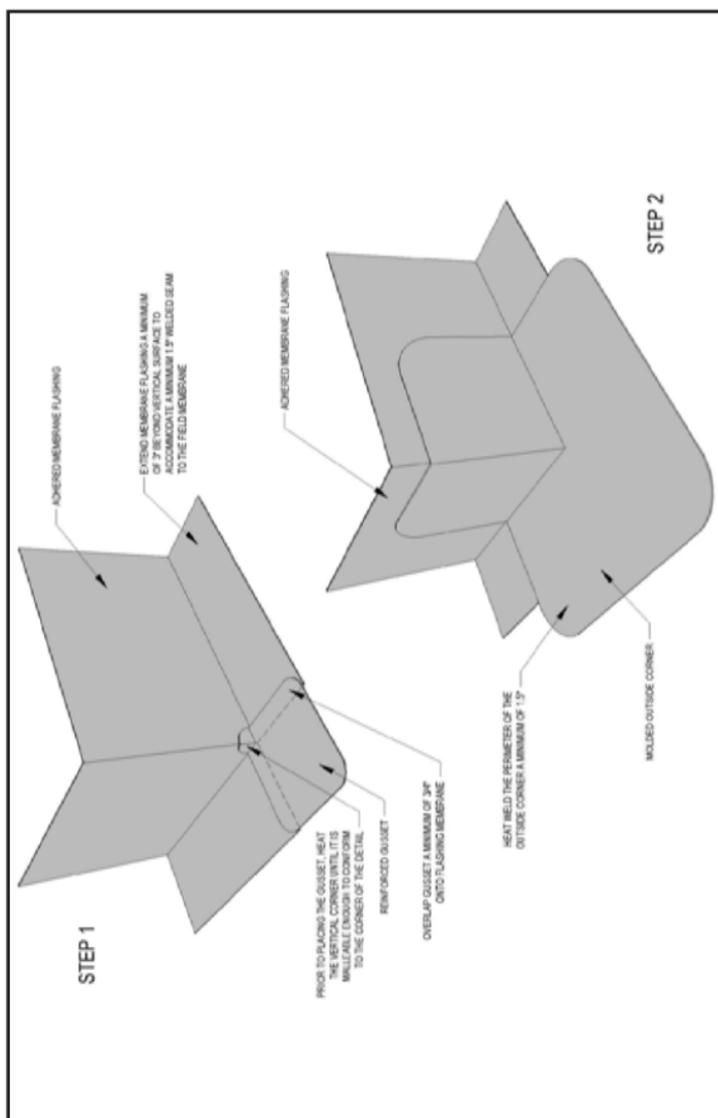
Adhered PVC Flashing Membrane At Molded Outside Corner
